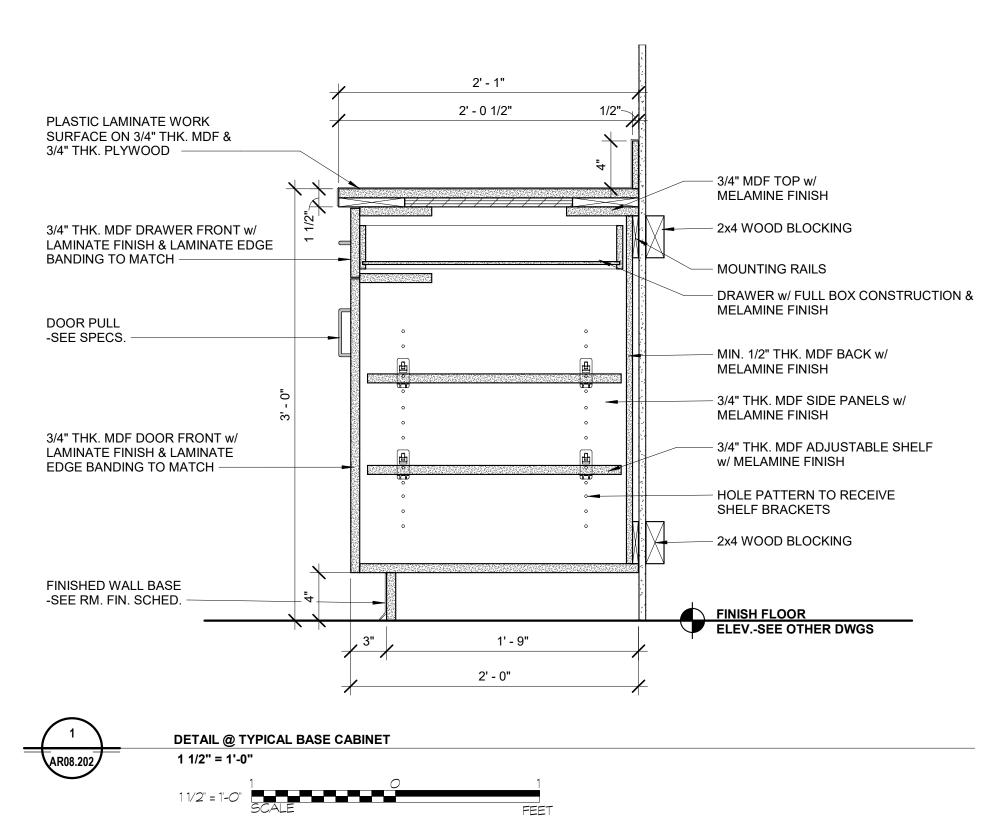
DETAIL @ TYPICAL BASE CABINET 1 1/2" = 1'-0"
